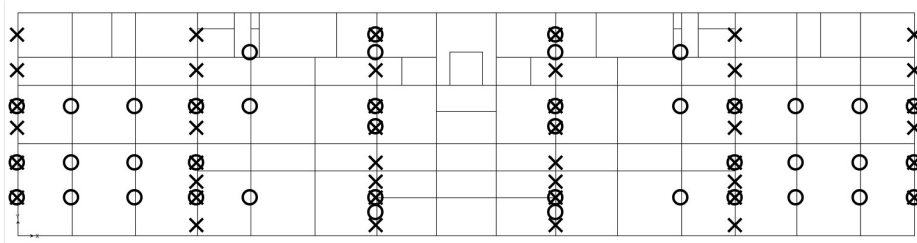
Damper Placement at 3rd floor (R-Y); MSSSA: 44 dampers; ODAM: 44 dampers
